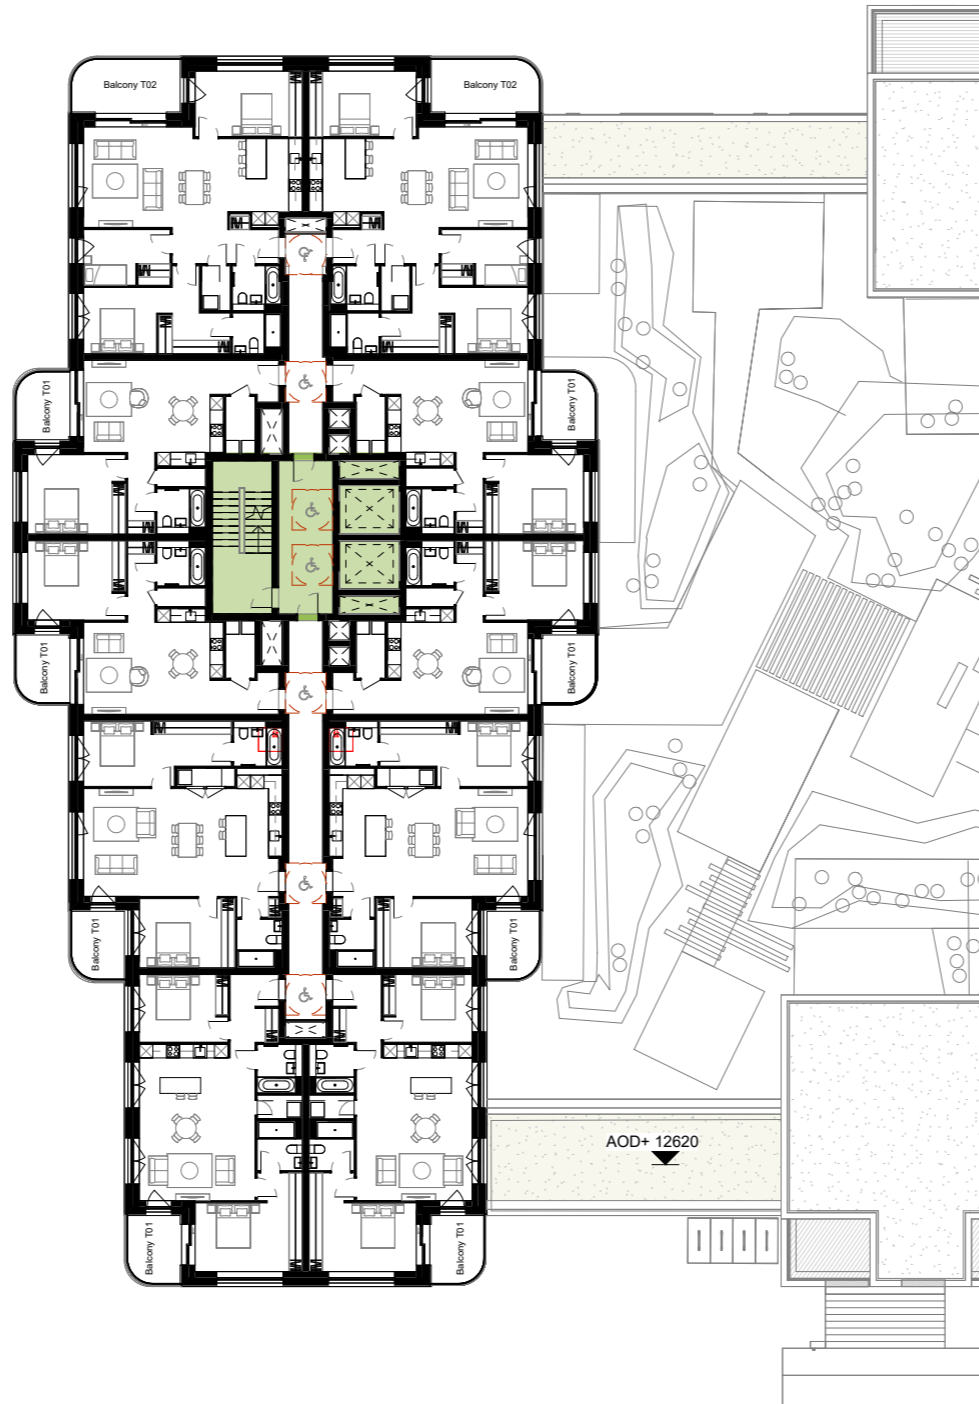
Block A Typical Floor Plan highlighting lift and stair cores
